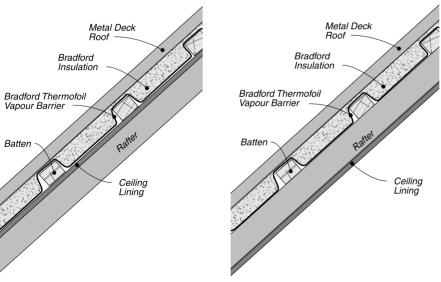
METAL DECK WITH CATHEDRAL (OR RAKED) CEILING AND FULLY EXPOSED RAFTERS.
